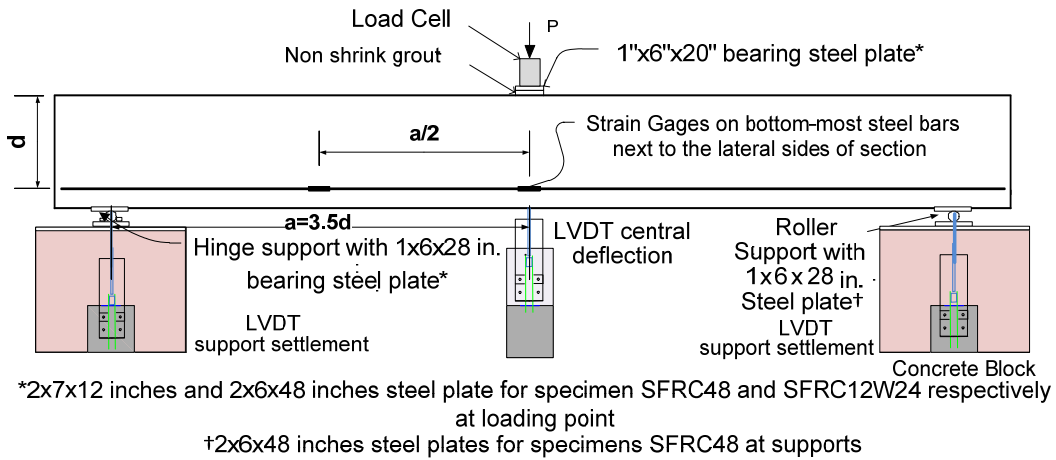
Schematic view of the test setup, loading configuration, and instrumentations
